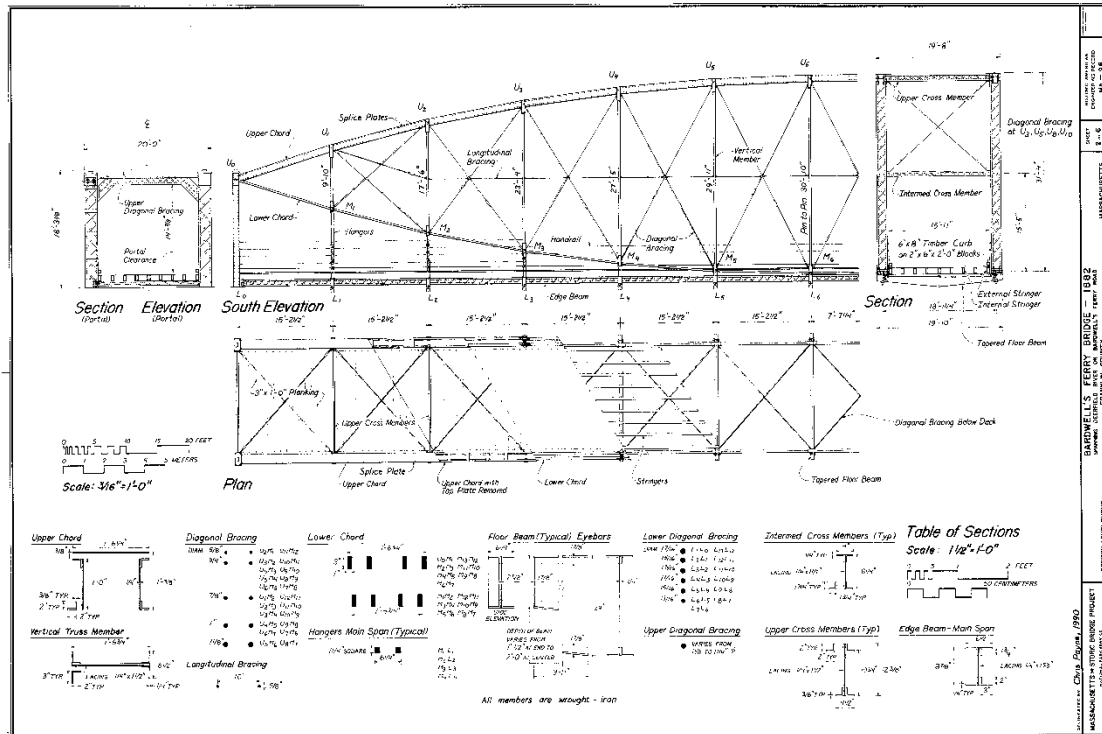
Elevation drawing of the Bardwell’s Ferry Bridge with geometries of load-carrying elements (courtesy of HAER/Library of Congress).
